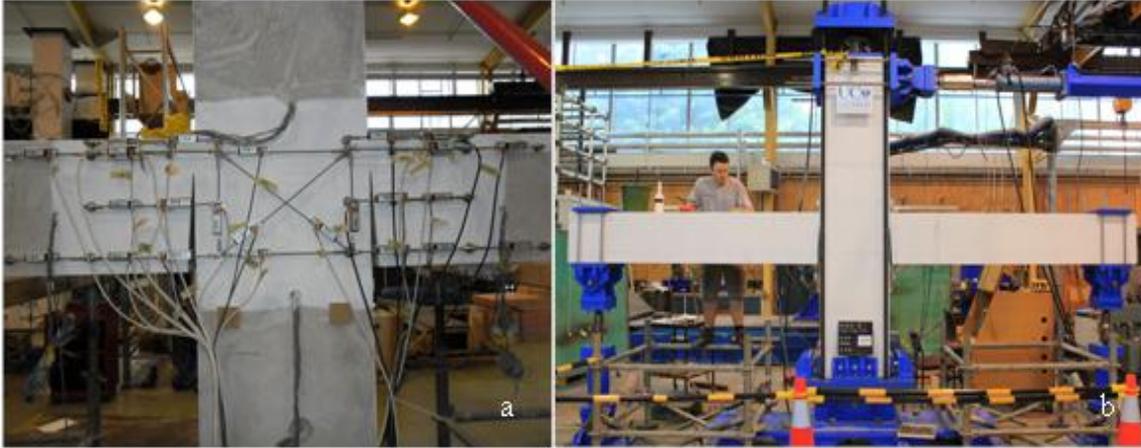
(a) Linear potentiometer layout; (b) Specimen in testing rig.
